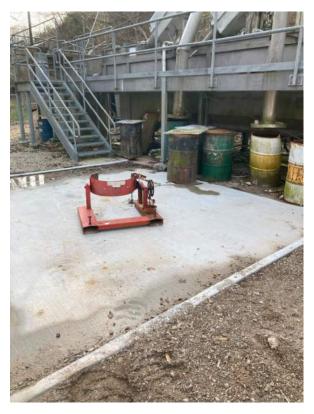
West side of newly constructed concrete slab adjacent to screening and grit removal equipment.
